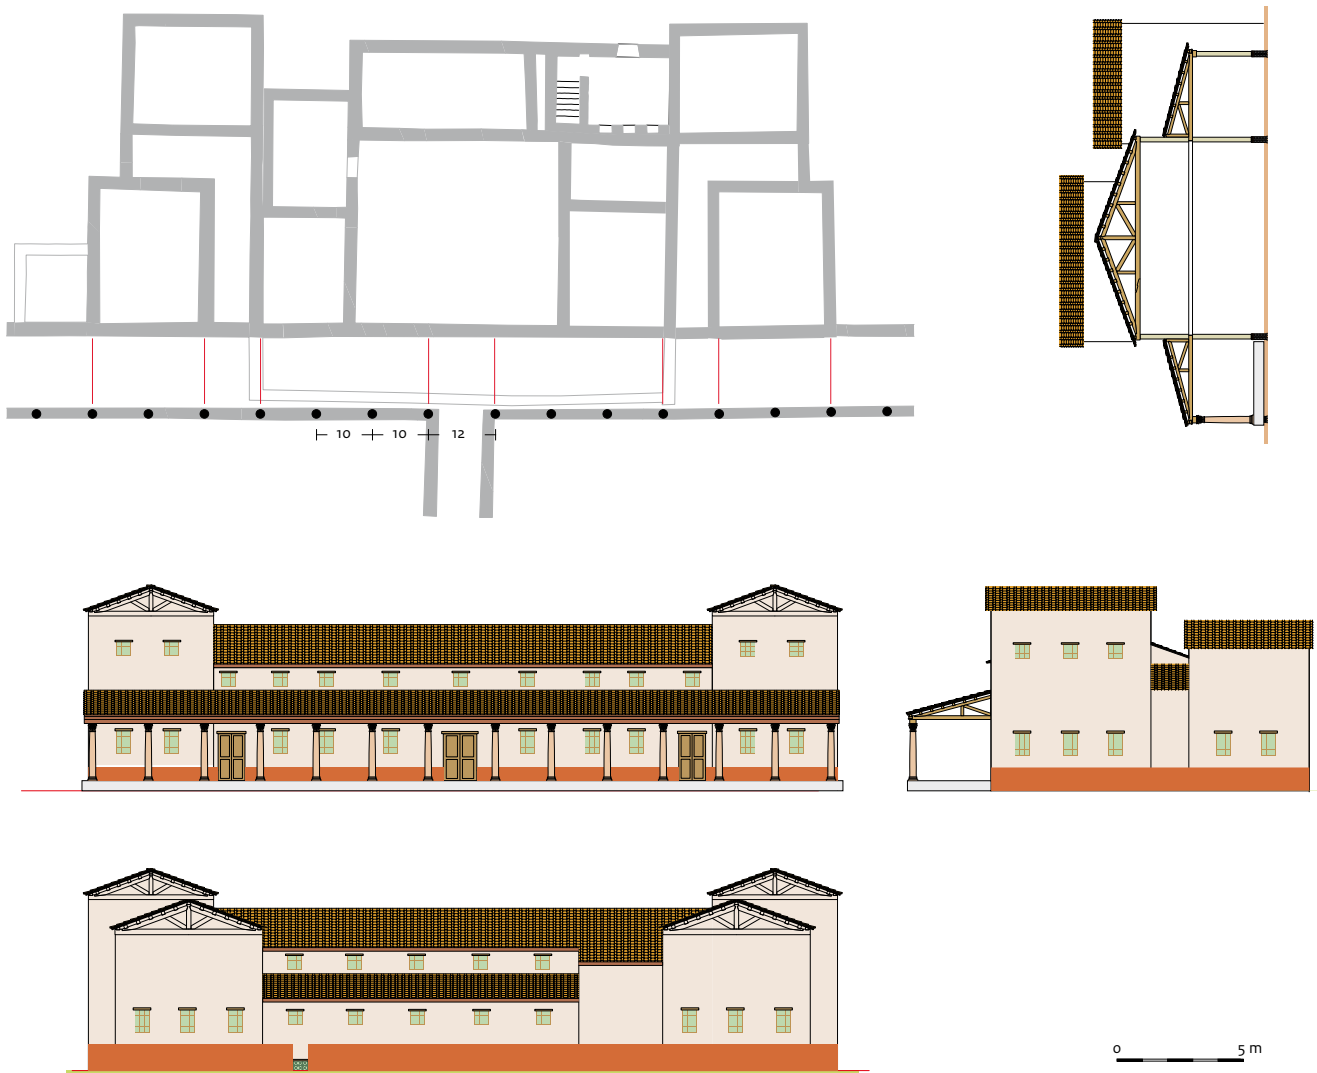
Voerendaal-Ten Hove. Reconstruction of the façade and side of the second villa, section through the central axis; with outlines of the roof-trusses and red lines indicating which columns (more or less) line up with the walls of the building.
